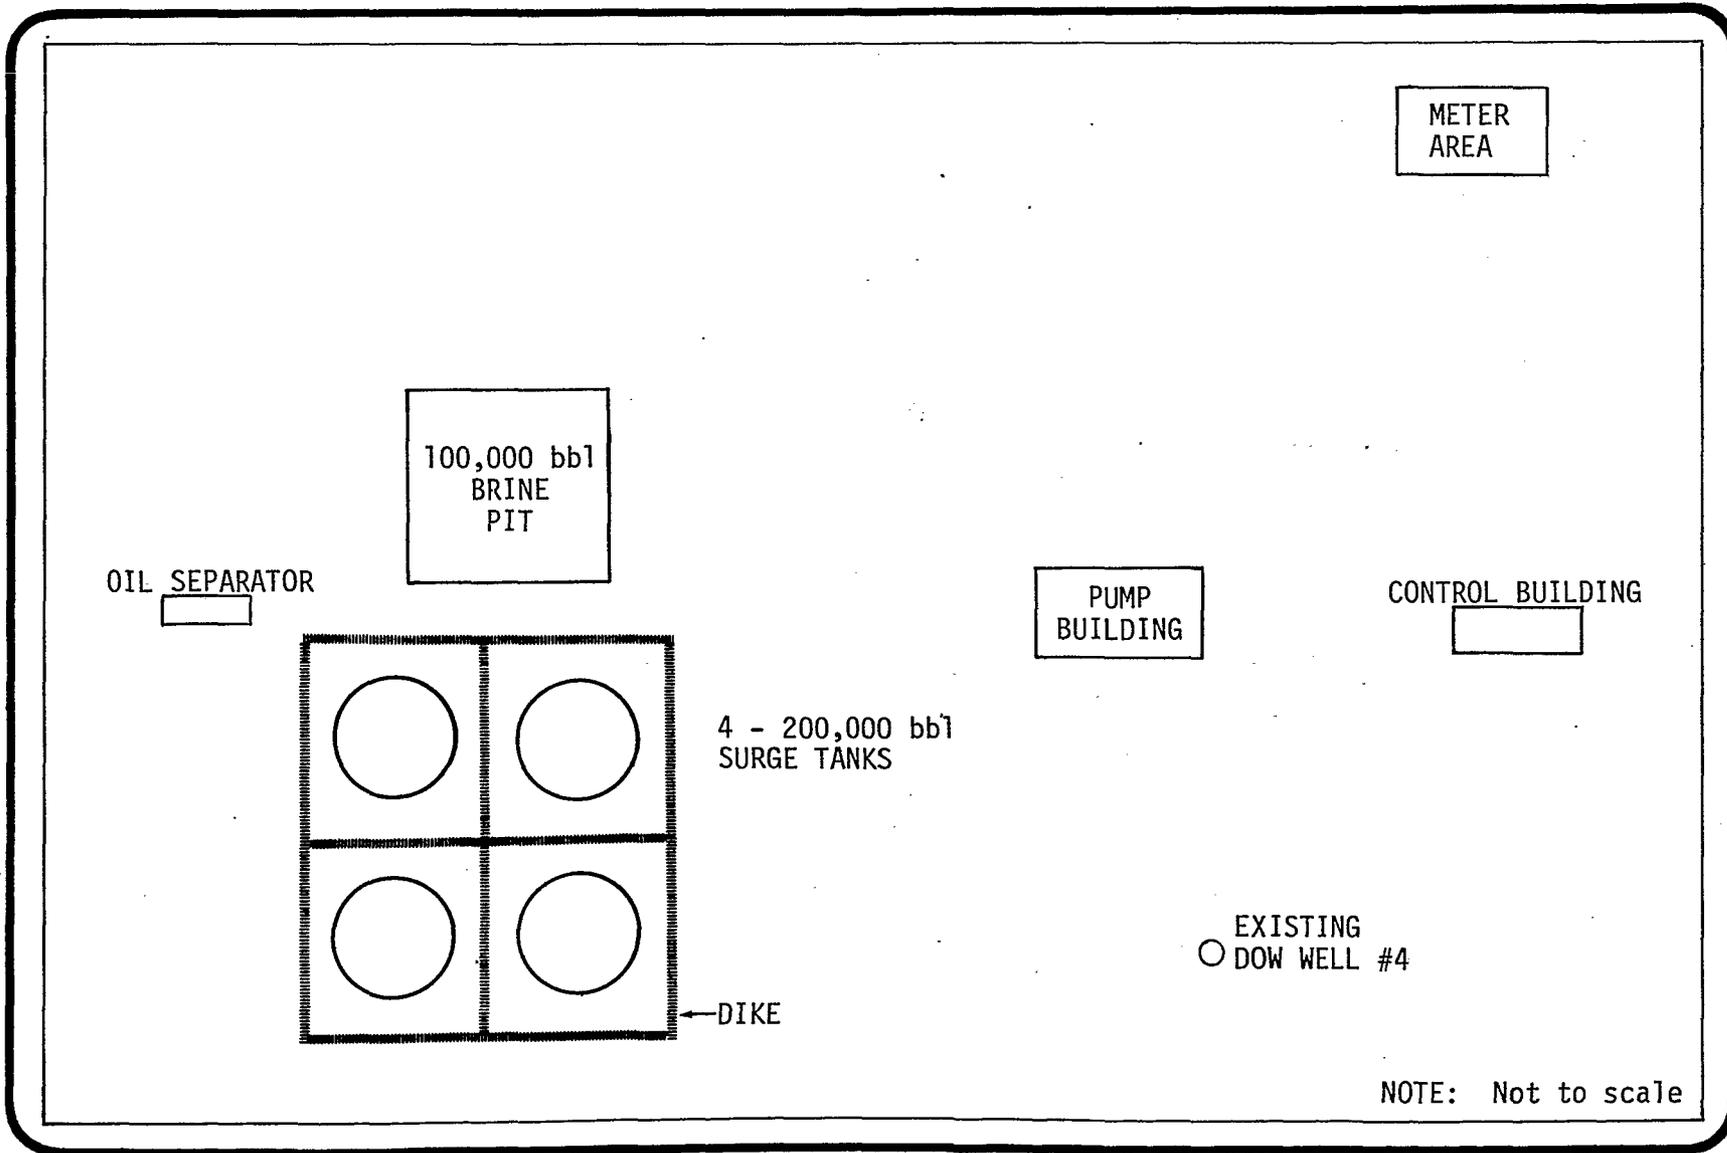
Plant layout - Bryan Mound dome (proposed site for Seaway SPR development).
